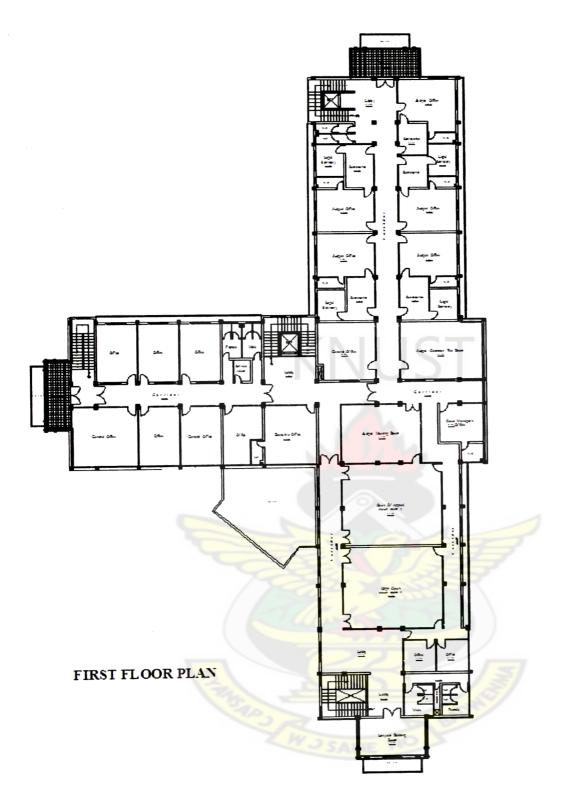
First Floor Plan. Kumasi Court of Appeal, Ghana.
